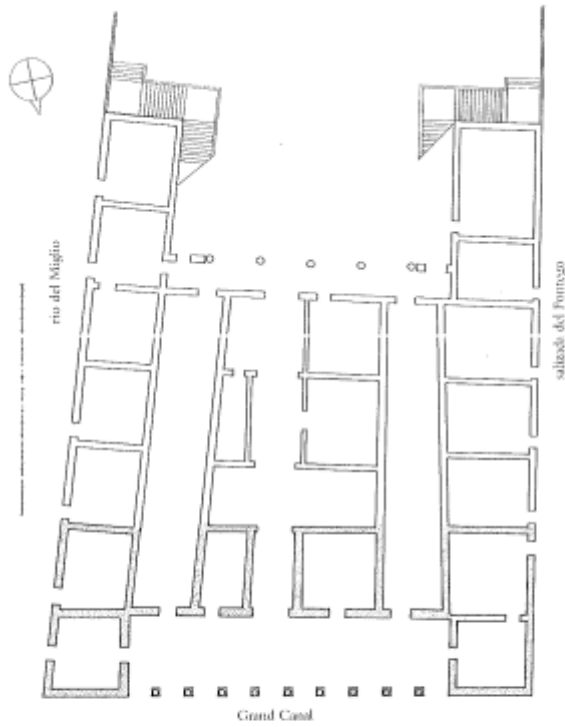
Venice, Fondaco dei Turchi, ground-floor plan, ca. 1600 (extant walls stippled; demolished walls outline).
